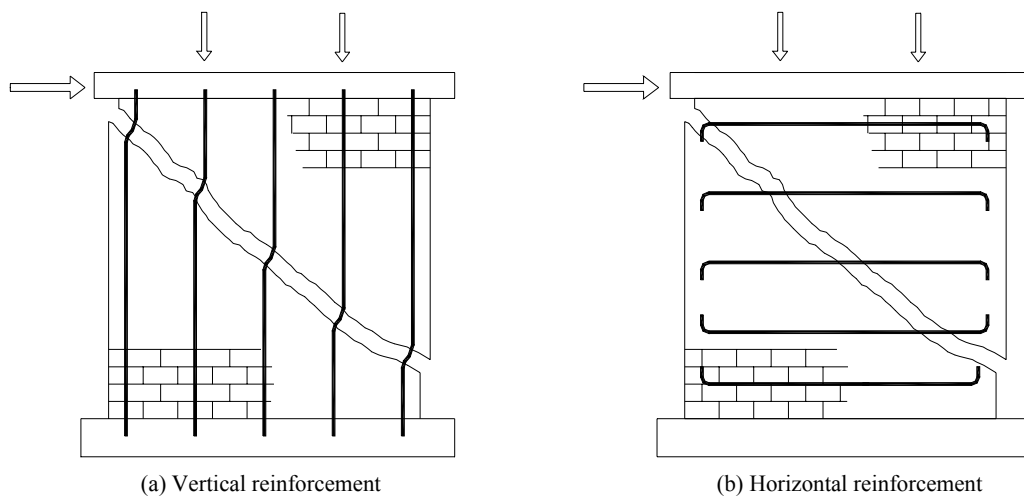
Role of reinforcement in resisting masonry shear failure.
